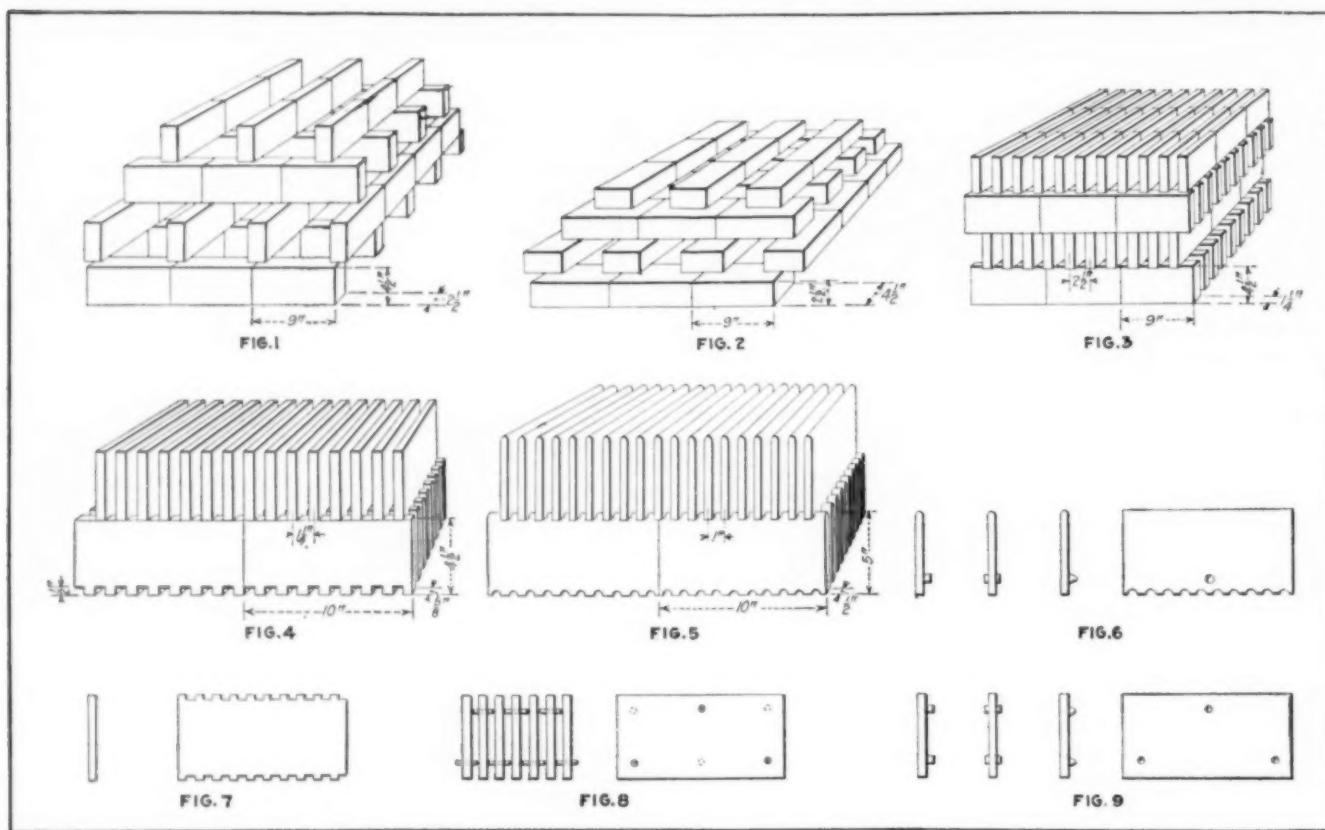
9-in. straight brick on edge 9-in. centers. Fig. 2. 9-in. straight brick flat 9-in. centers. Fig. 3. 9-in. split brick 2.5-in. centers. Fig. 4. Brick checkerwork. Fig. 5. $\frac{1}{2} \times 5 \times 10$ -in. tile. Fig. 6. Detail of tile provided with semi-circular, square, triangular or other type notches at foot and with top edge to correspond to the notches, also with knob for proper spacing. Fig. 7. Detail of tile with notches of any shape at head and foot for proper spacing. Fig. 8. Detail of tile with holes and dowels for proper spacing. Fig. 9. Detail of tile with knobs of any form for proper spacing.
